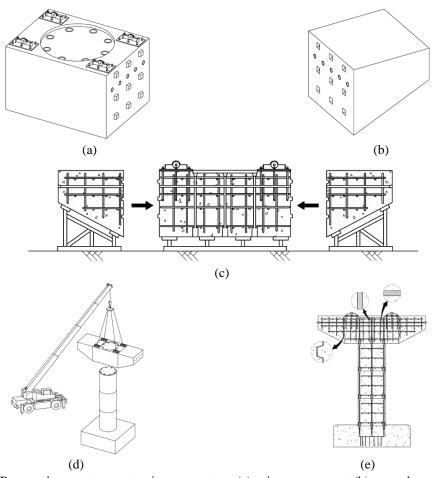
Proposed precast concrete pier cap system: (a) primary segment; (b) secondary segment; (c) assembly of precast concrete pier cap segment; (d) installation of precast concrete pier cap segments; and (e) completion of precast concrete pier cap system
